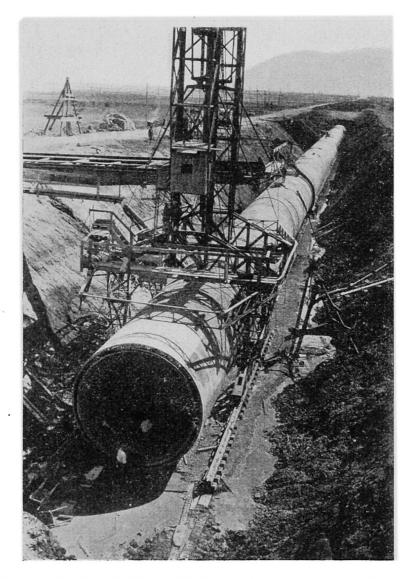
Volturno pipeline (S.M.E.). Plain reinforced concrete pipes, diam. 4.20 m (Impresa Ferrocemento).
